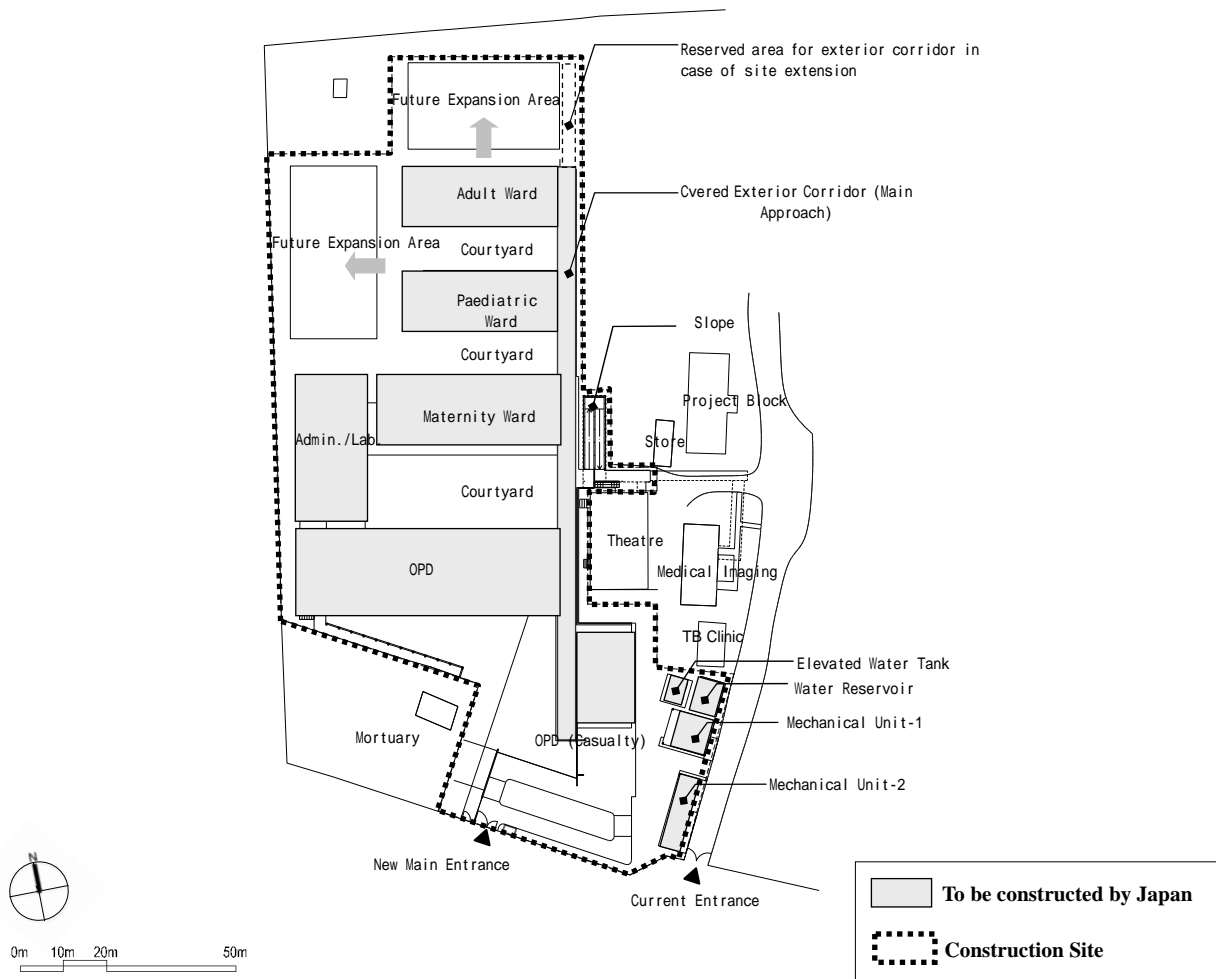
Existing facilities and the layout plan of Matero UHC project facilities
